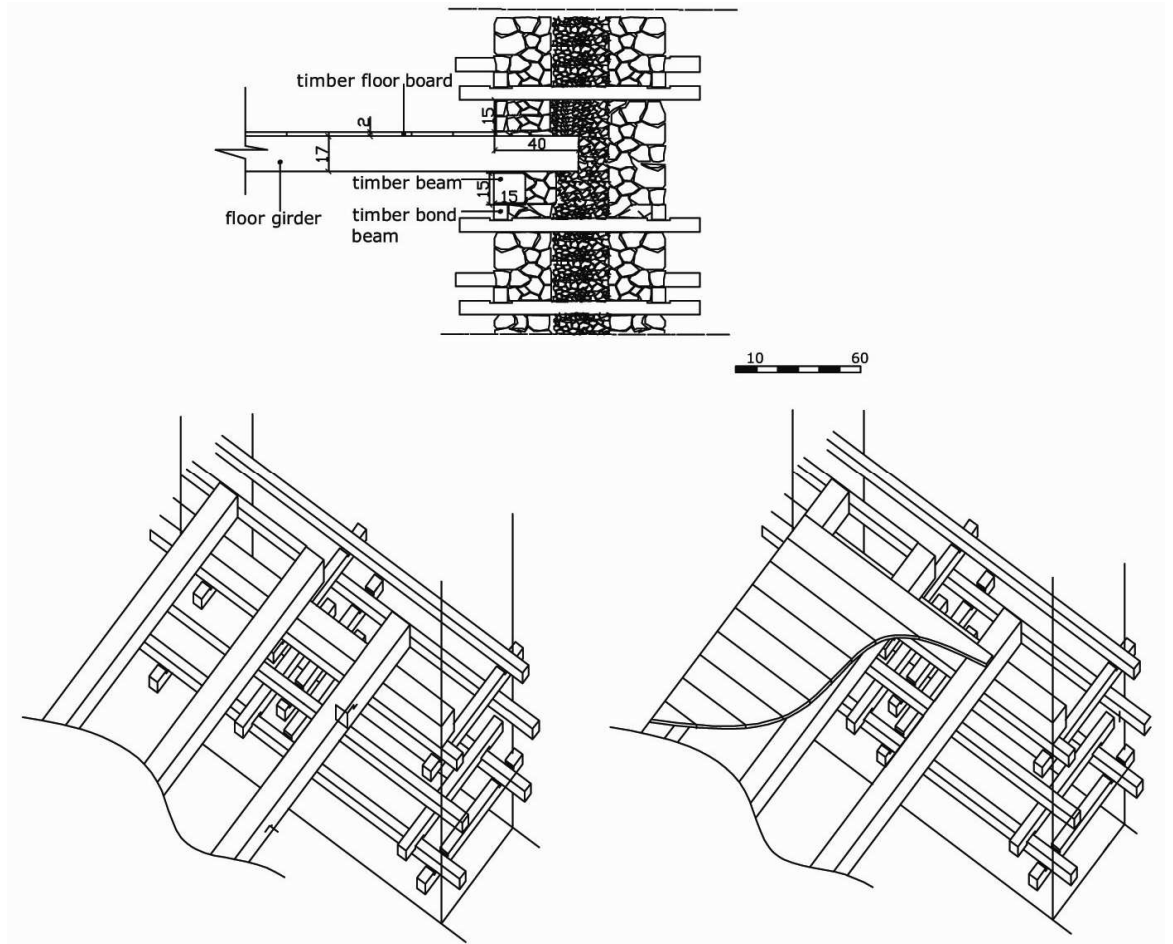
28 Drawing of the floor construction type 1. Çelik 2008.
